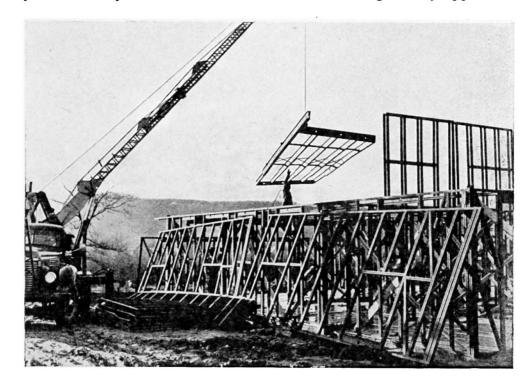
Erection of prefabricated wall and floor panels for two-storey apartment houses (Stran Steel Division, Great Lakes Steel Corp.)
